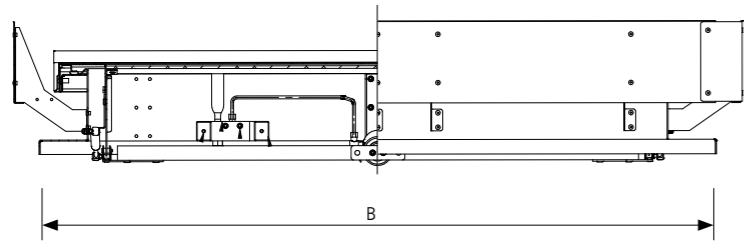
Section B-B of mcr LAM louvered smoke vent in closed position (roof installation)
